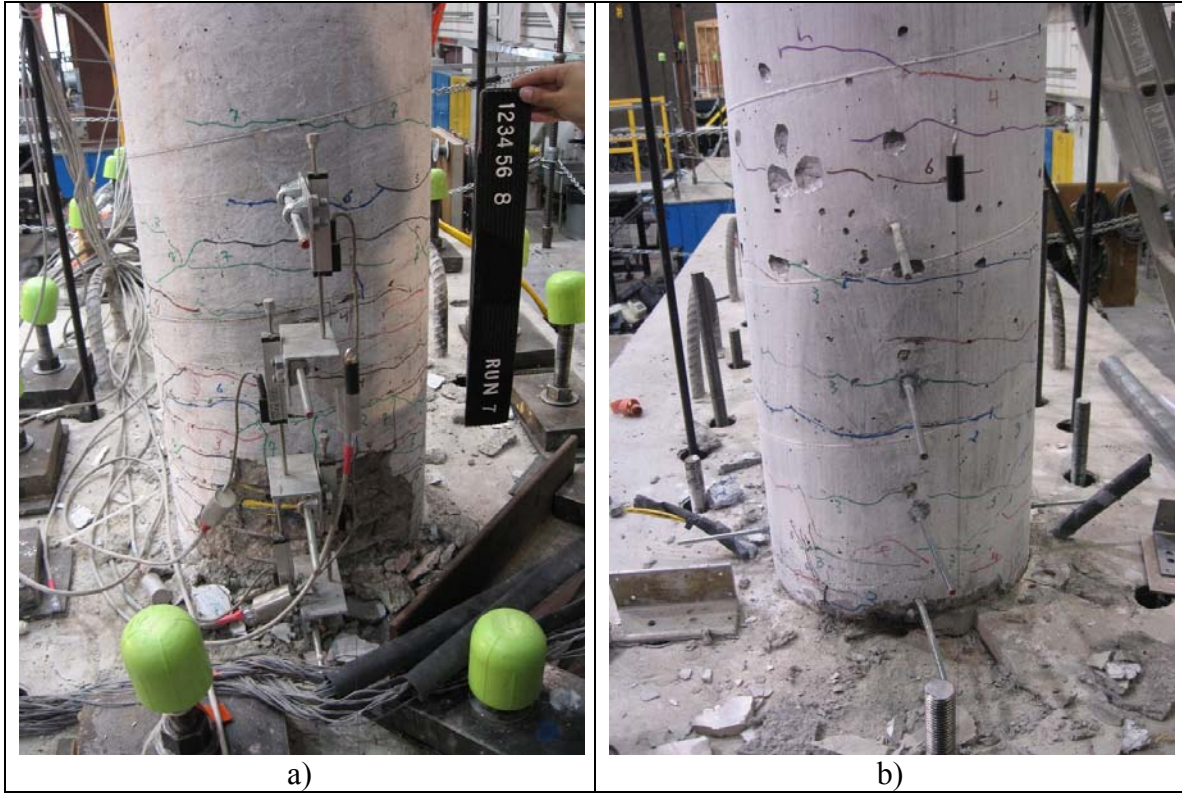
Apparent Damage at Failure Point in RC and RC-ECC Columns, North a) PPTC (CIS) [Zaghi and Saiddi, 2010a], b)PEFB (Precast)
